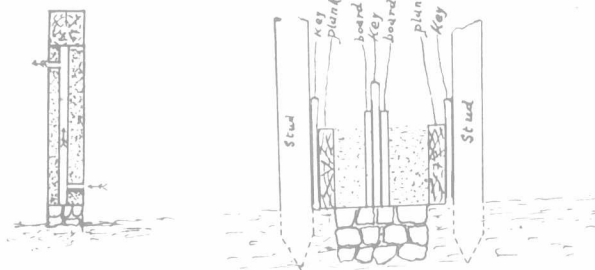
Section of wall showing air space in center; also inlets for fresh air.
